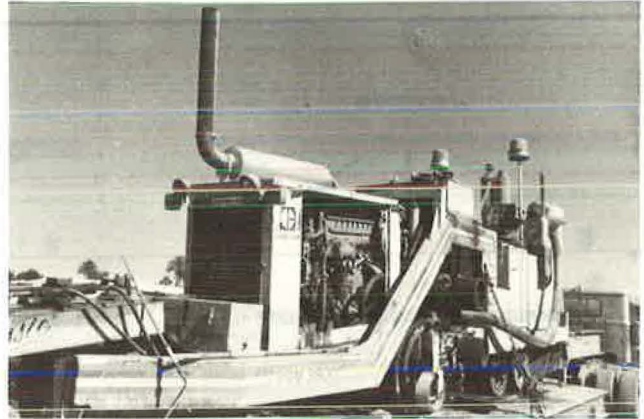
Insulated panel for main engine, lined with 1-in.-thick foam rubber.
